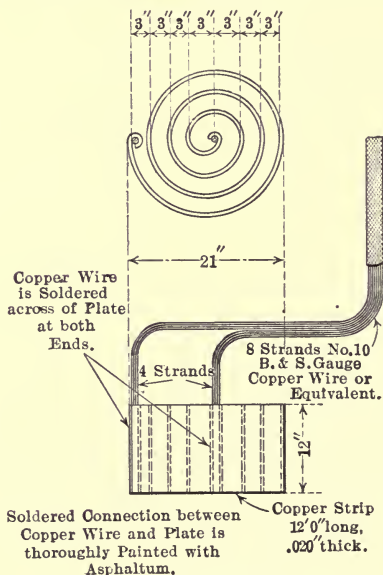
DETAILS OF A COPPER SPIRAL.
